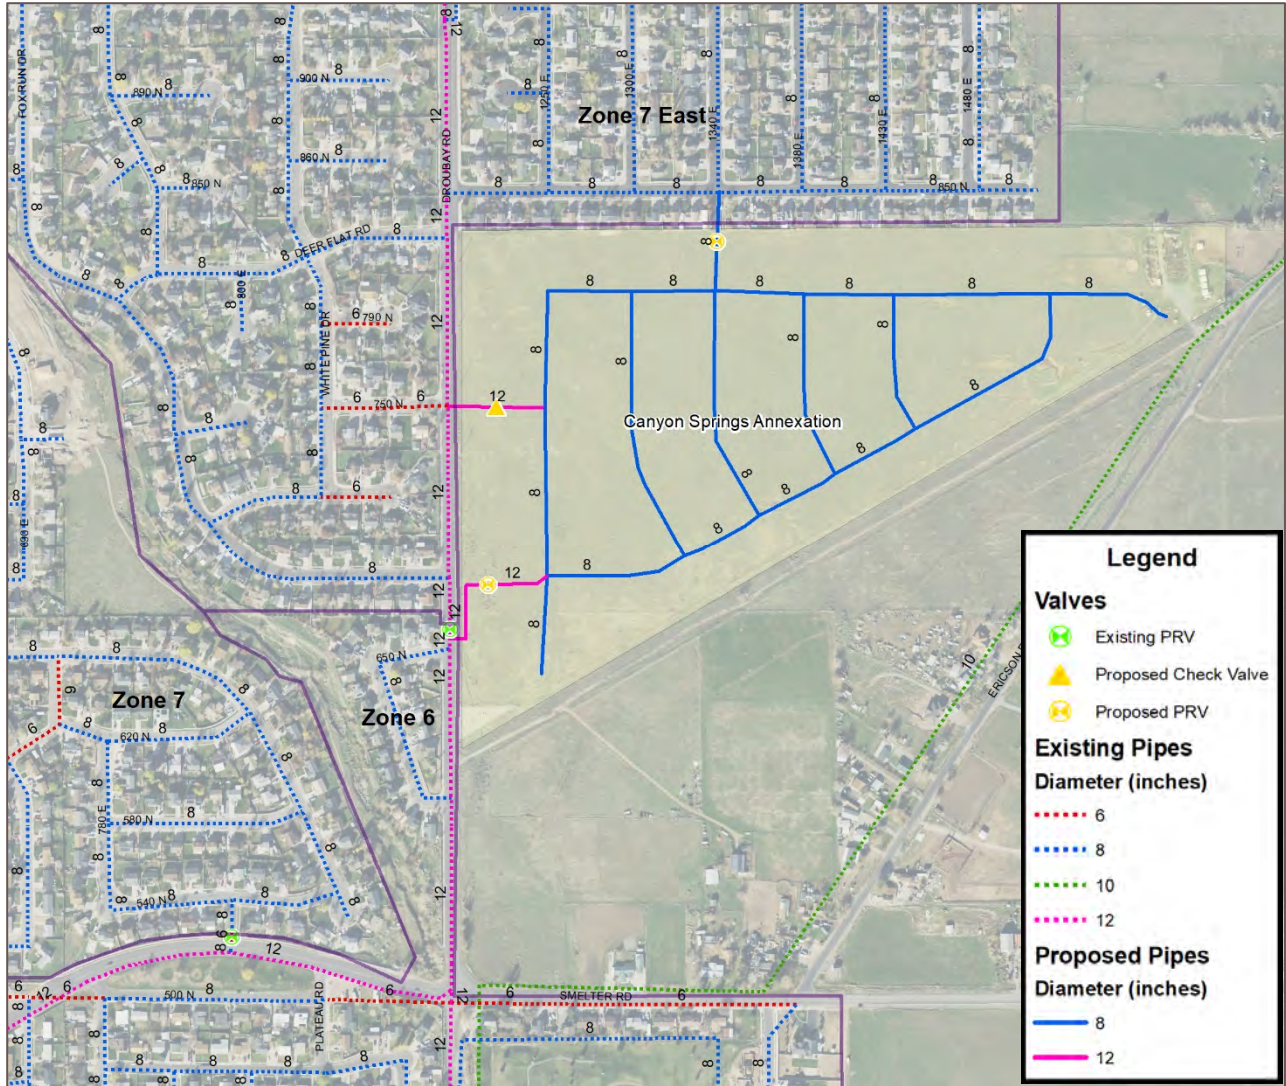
DEVELOPMENT LOCATION AND DRINKING WATER SYSTEM PIPE SIZE
